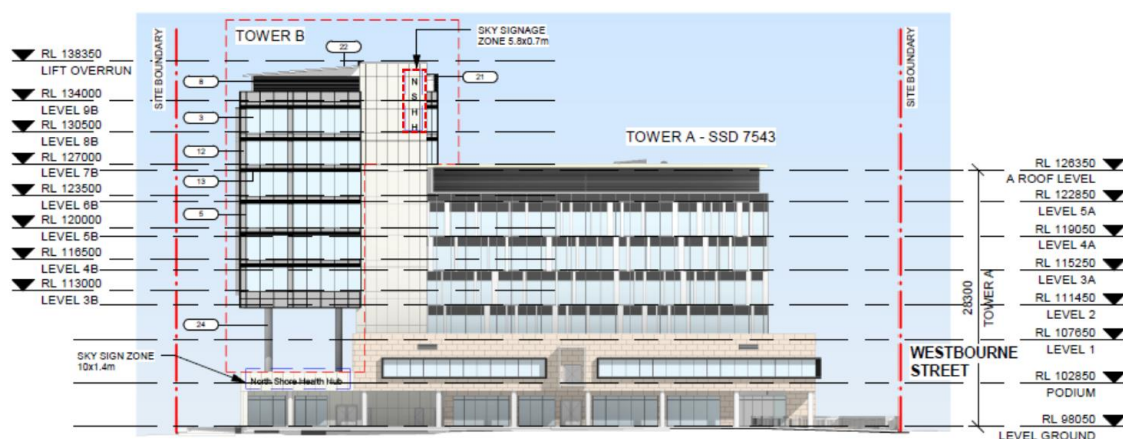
Proposed signage zone western elevation Tower B (Source: Billard Leece Partnership)
